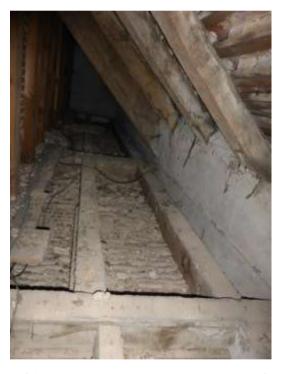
Structure of the ceiling over F5 and machine sawn timbers of an ashlar wall in A5
